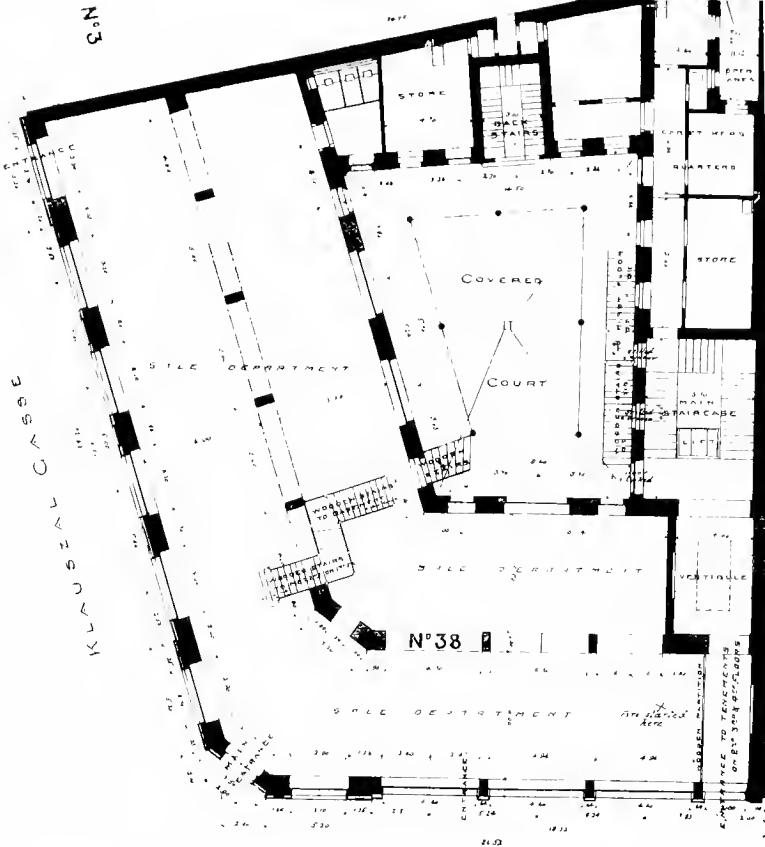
THE PARISIEN STORE FIRE, BUDAPEST. PLAN OF GROUND AND FIRST FLOORS.
